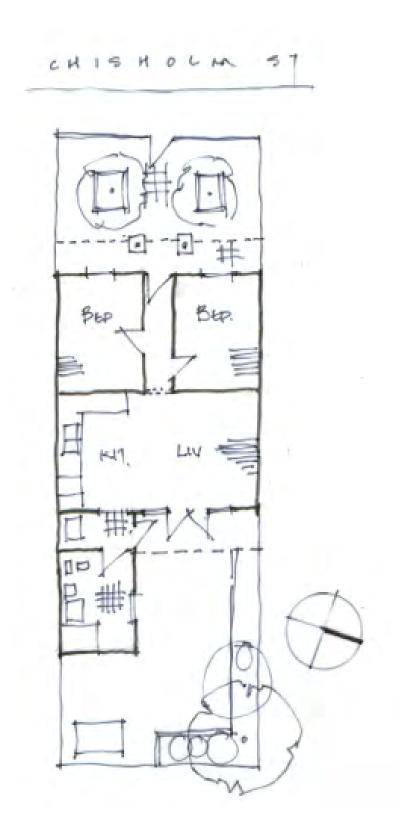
46 Chisholm Street, Darlinghurst Plan as existing
